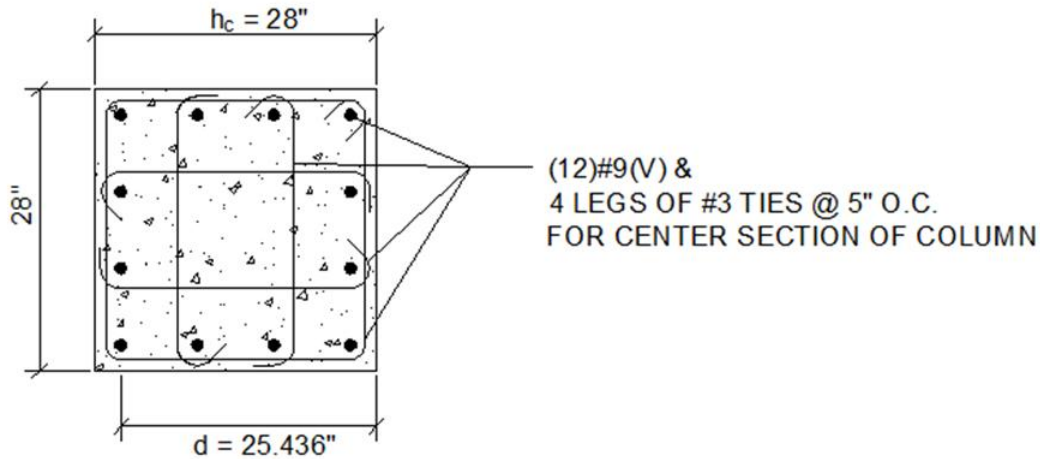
Exterior column, cross-section at center of column at the 4th floor level based on tsunami design requirements.
